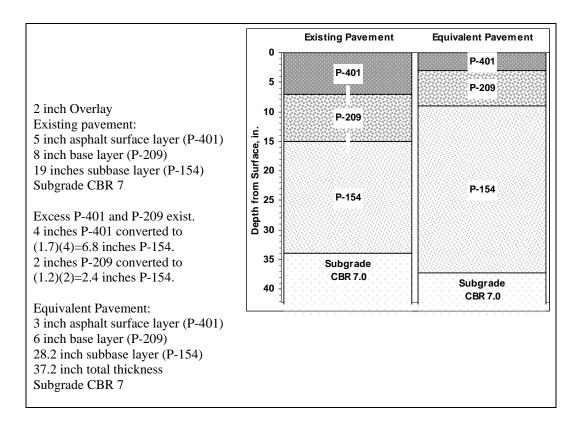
Flexible Pavement Overload Illustration 2 (Overlay) Example 1 Cross-Section
